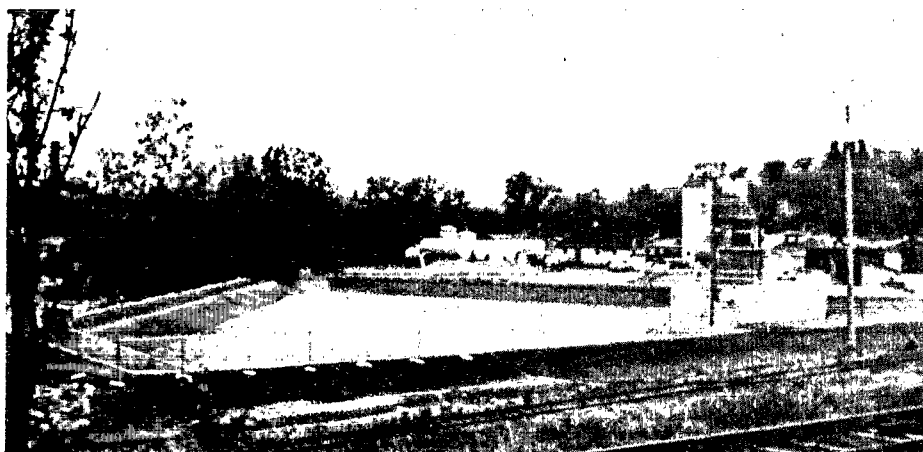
Asphalt-lined basin providing storage for up to 3.5 MG, Chippewa Falls, Wisconsin.
